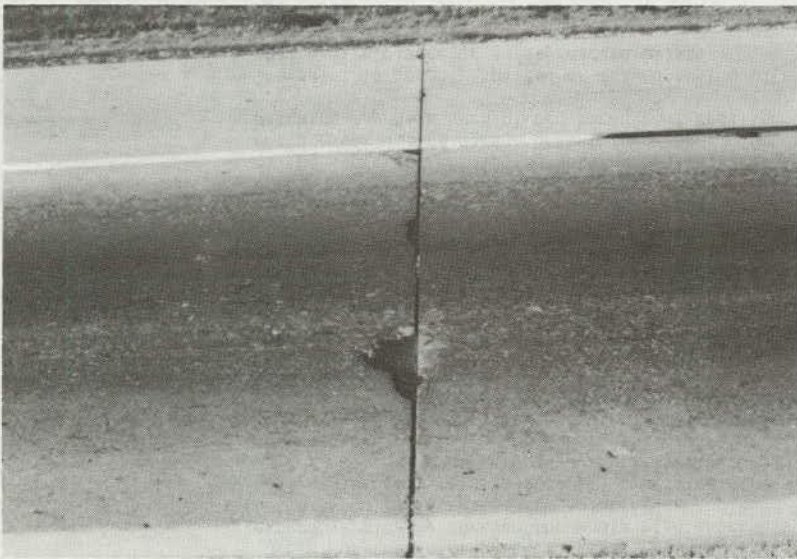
Medium-Severity Spalling (Transverse Joint).
